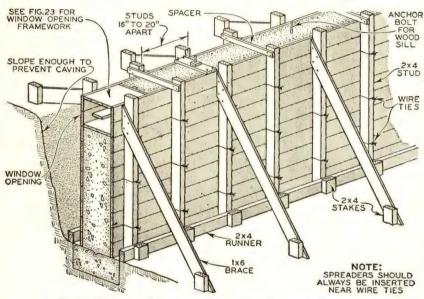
Tailor-Made Formwork for Concrete Foundation or Wall
